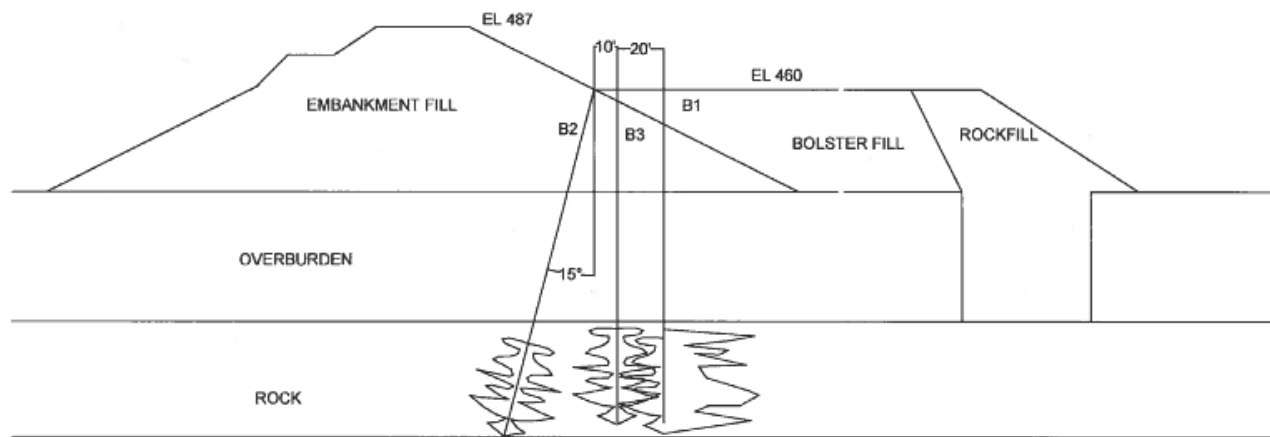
Plan B- Void Filling with More Mobile Grouts (not to scale)
